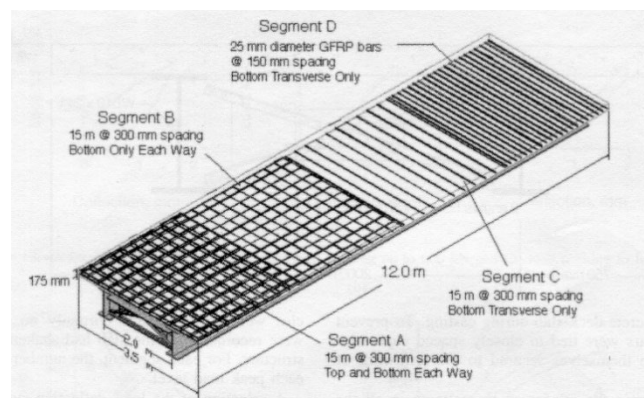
Details of a full-scale deck slab model (Khanna et al., 2000).
